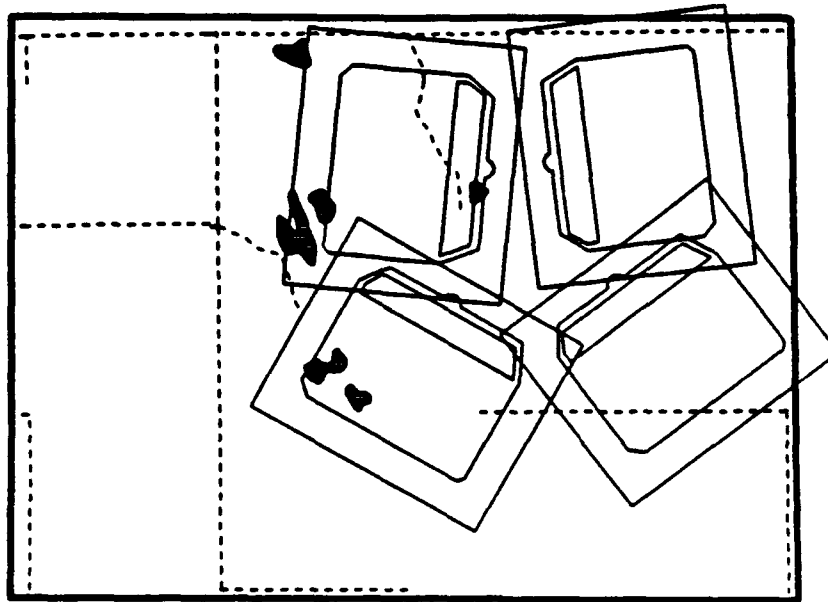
TX-NORTH PRELIMINARY SITE LAYOUT
